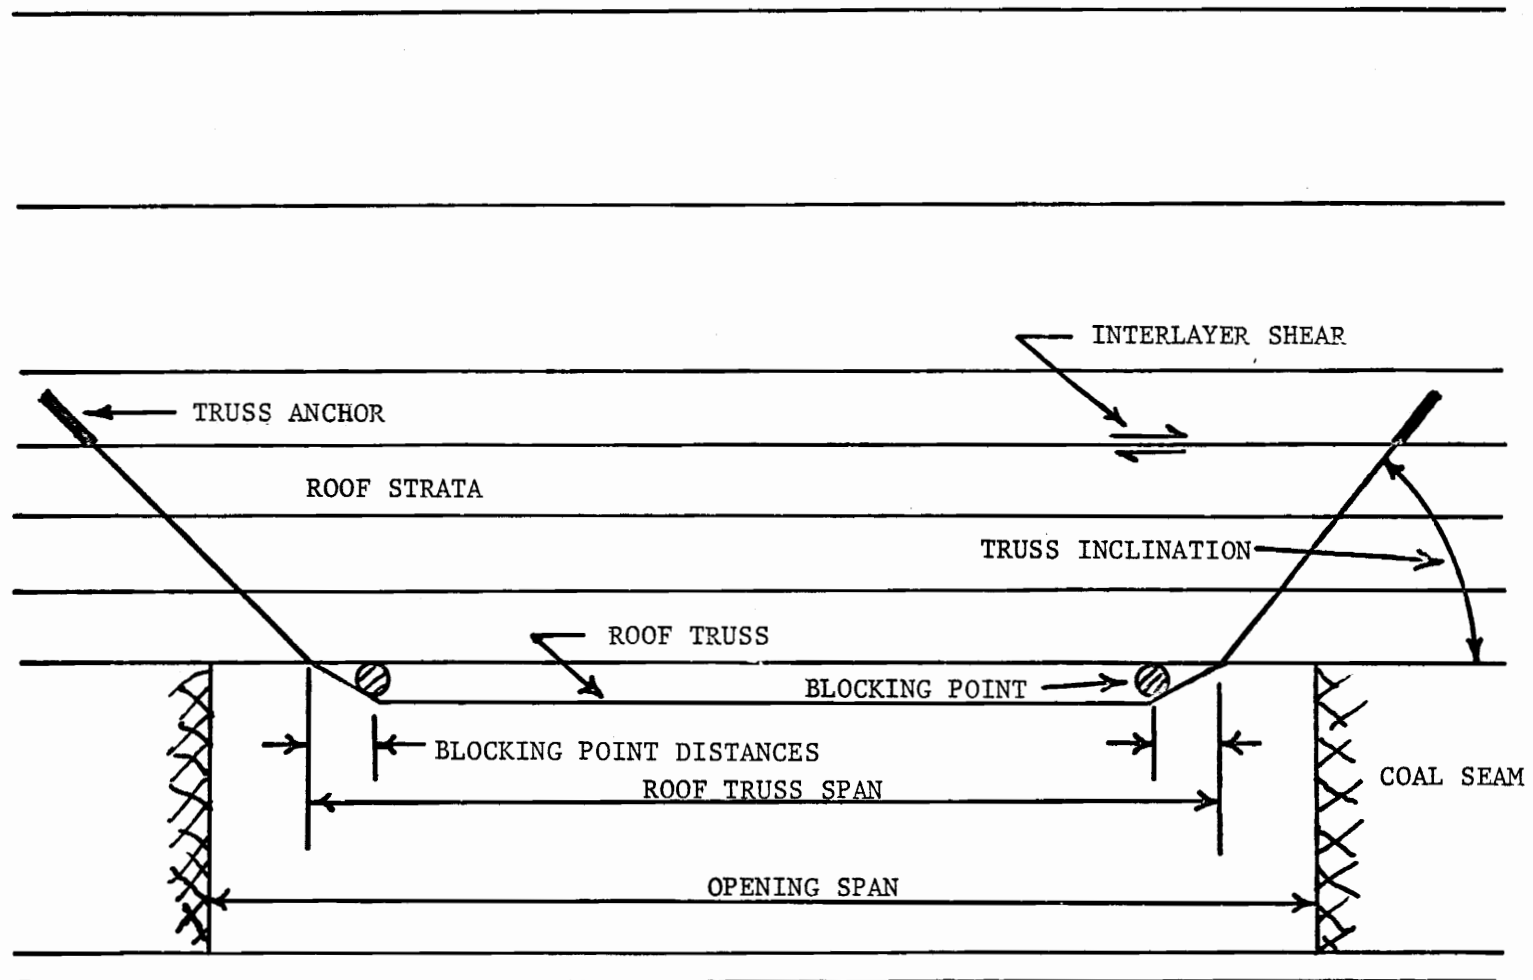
Schematic of Roof-Truss Installation in Photoelastic Mine Model.
